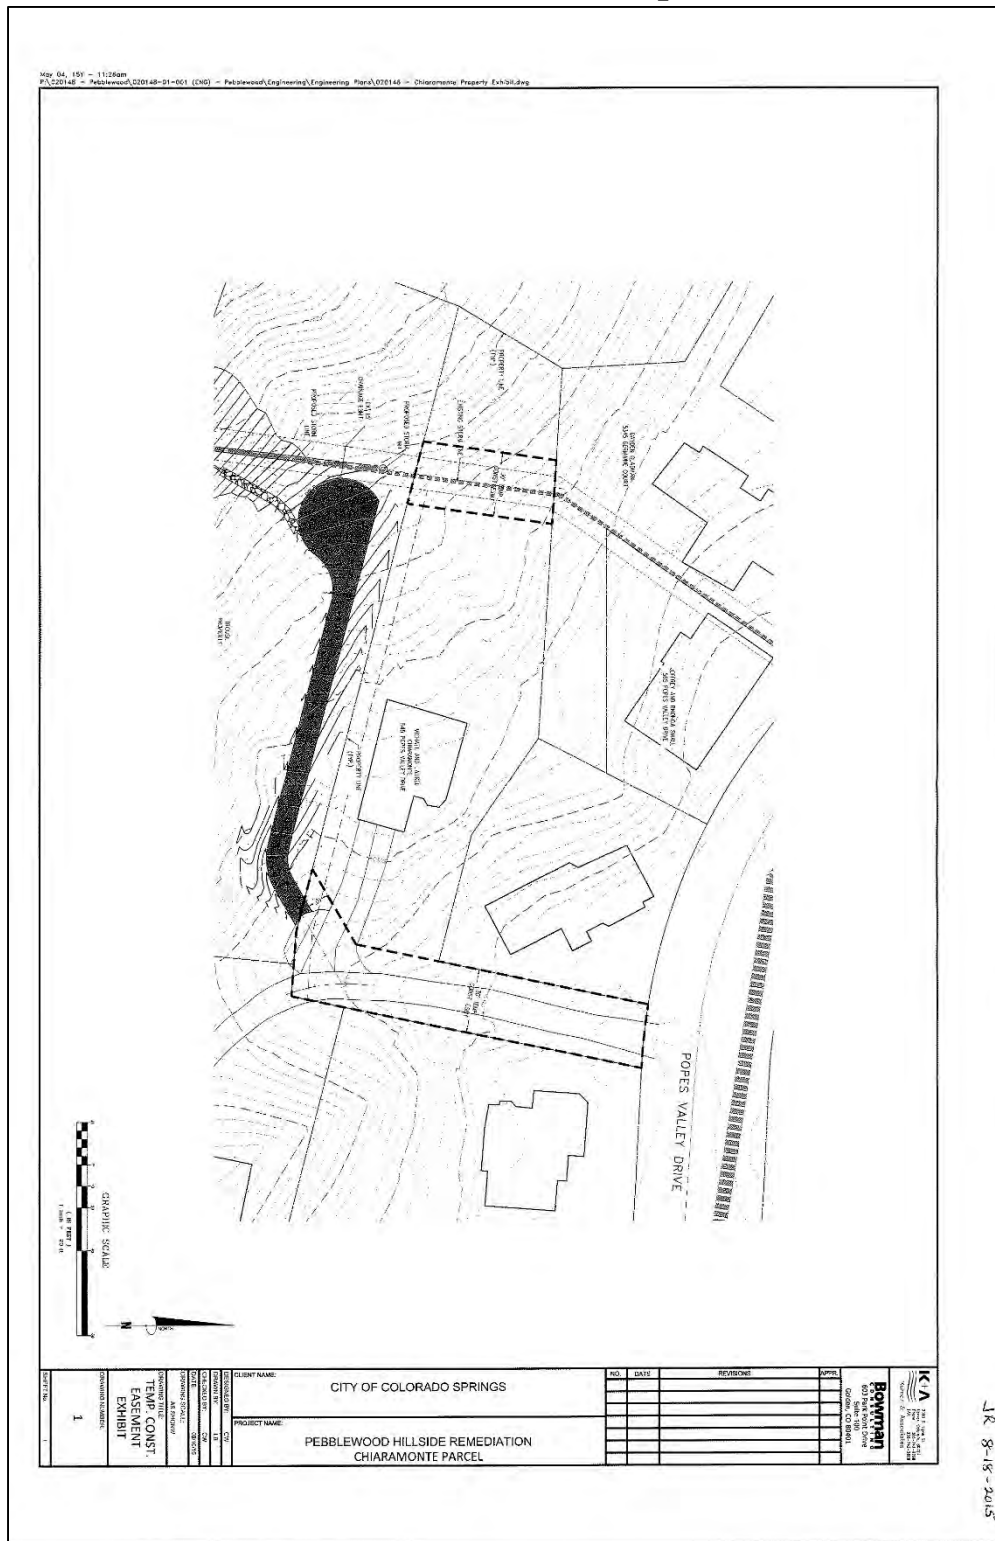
City provided proposed plan, dated March 10, 2015, for addressing stormwater runoff from the Pebblewood at Pinecliff MS4 outfall. It should be noted that these proposed plans appeared to include the addition of a stormwater pipe to convey stormwater flows below the City’s MS4 outfall directly to the Popes Valley drainage. It did not appear that the City was implementing the Four-Step Process 1-Runoff Reduction Practices; 2-BMPs with WQCV; 3-Stabilize Drainageways; 4-Need for Industrial/Commercial BMPs) as outlined in the City’s DCM Vol 2 as part of this remediation project (Page 2 of 2).
